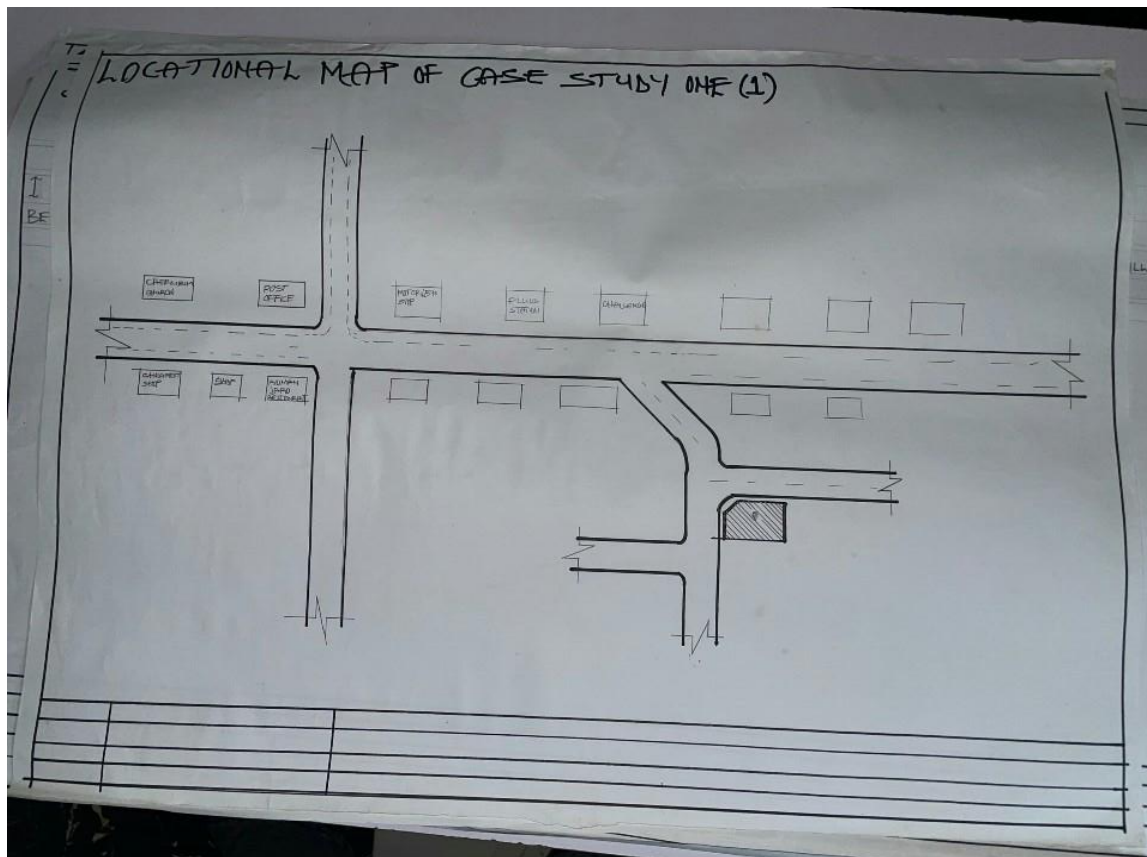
LOCATIONAL PLAN OF CASE STUDY ONE
